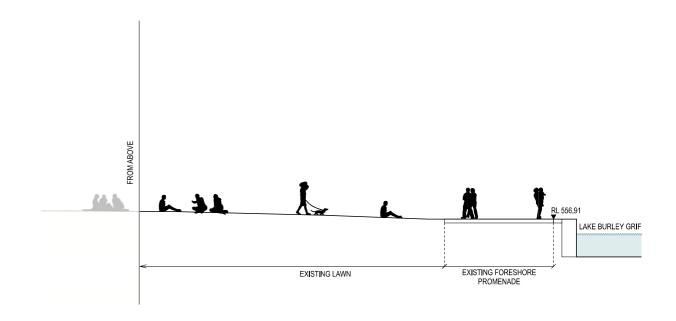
North-east quadrant cross section 8 (Scale 1:200)
